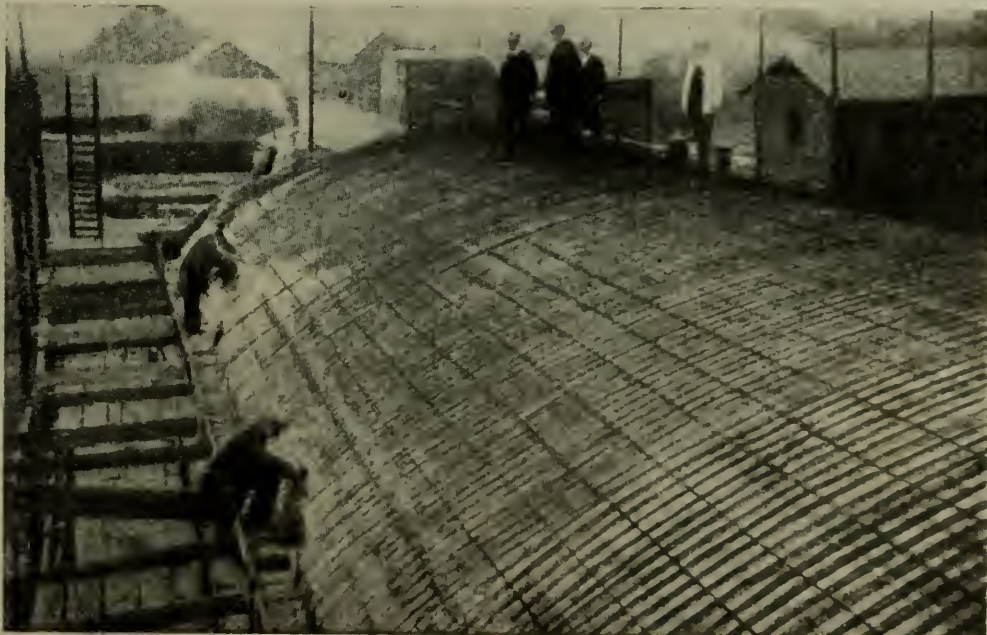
LIGHT CONCRETE ROOF AT HOMBERG.
